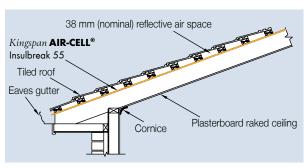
Side elevation of *Kingspan* AIR-CELL Insulbreak® 55 in a tiled roof with a raked ceiling
